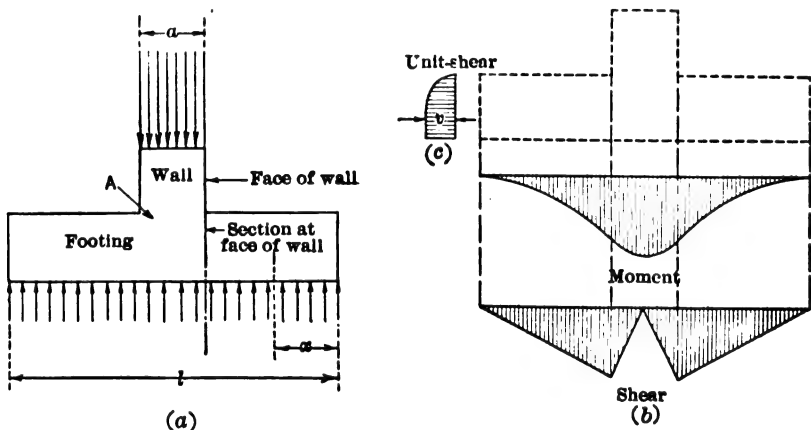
DISTRIBUTION OF LOAD AND PRESSURE IN FOOTINGS.
